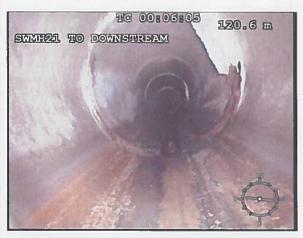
9a 121.6m, Encrustation heavy at joint, 25% cross-sectional area loss
